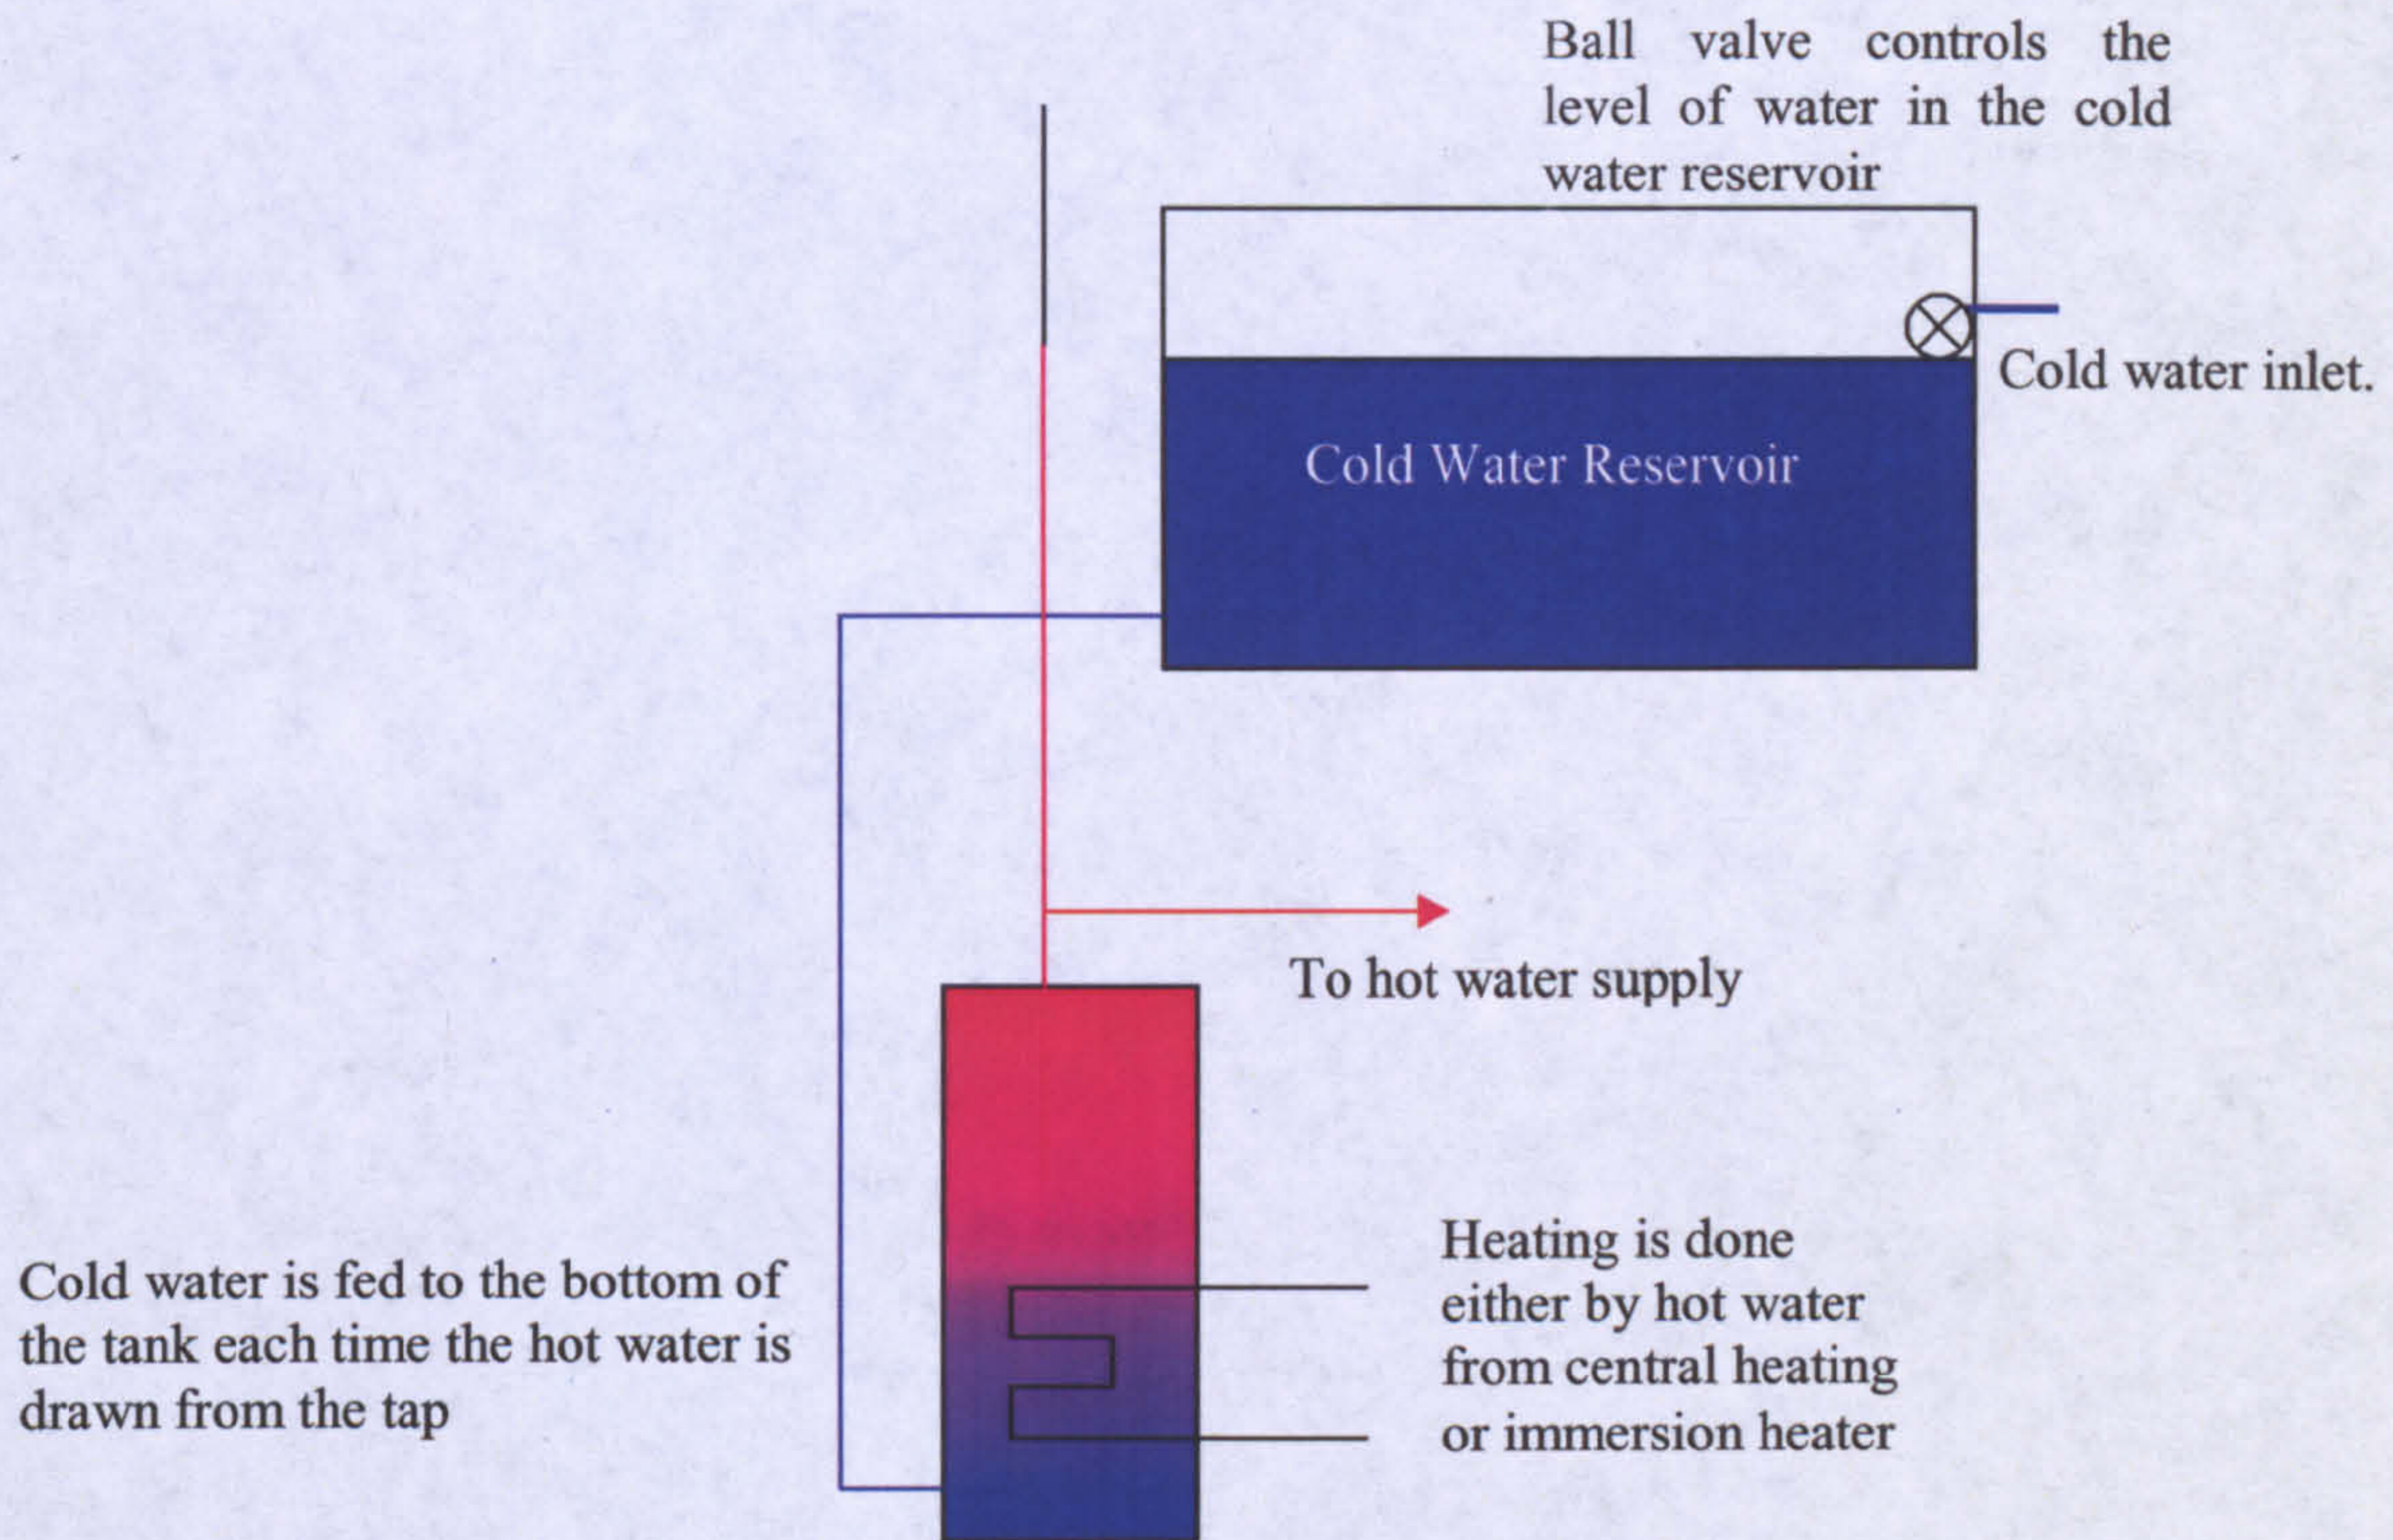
Plumbing details of an open vented hot water system without solar collector
